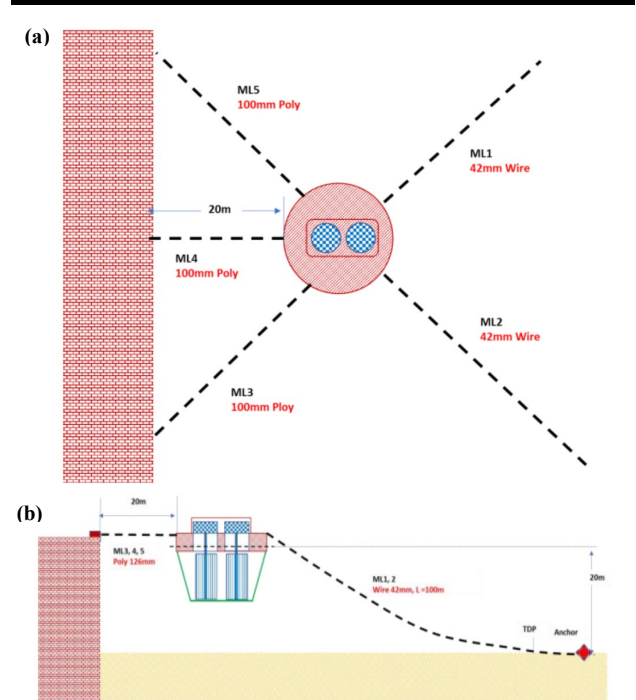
Pontoon platform mooring layout (plan view (a) and elevation view (b)).
